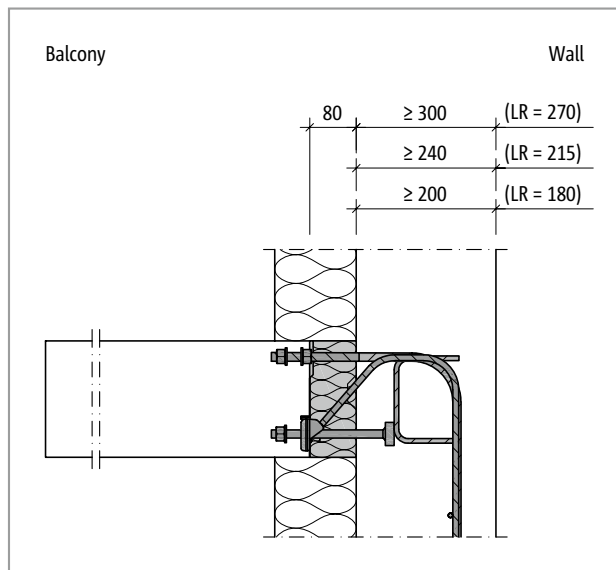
Schöck Isokorb® T type SK-WU: Special construction for wall connection
